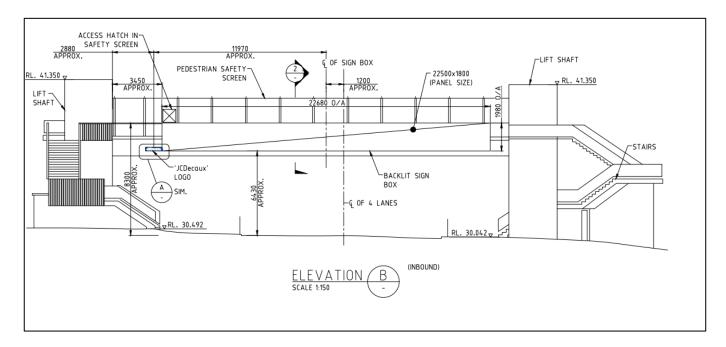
| Sign elevation – northeast (Source: Revised architectural plans 01/11/24)
